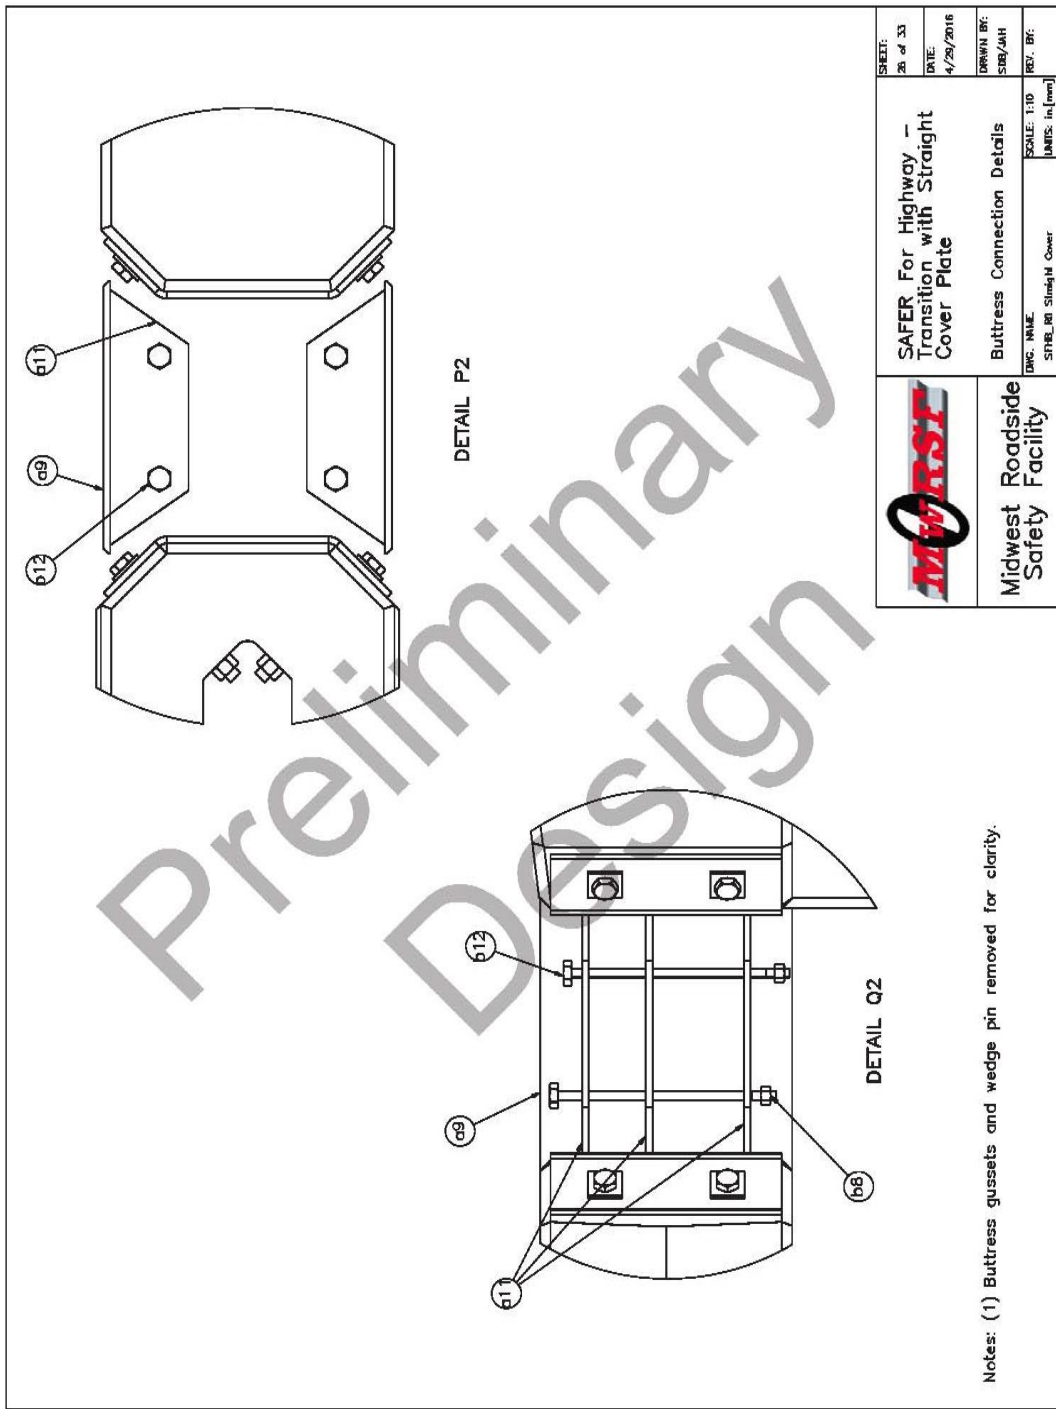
Buttress Connection Details, Straight Cover Plate, RESTORE Barrier Transition
